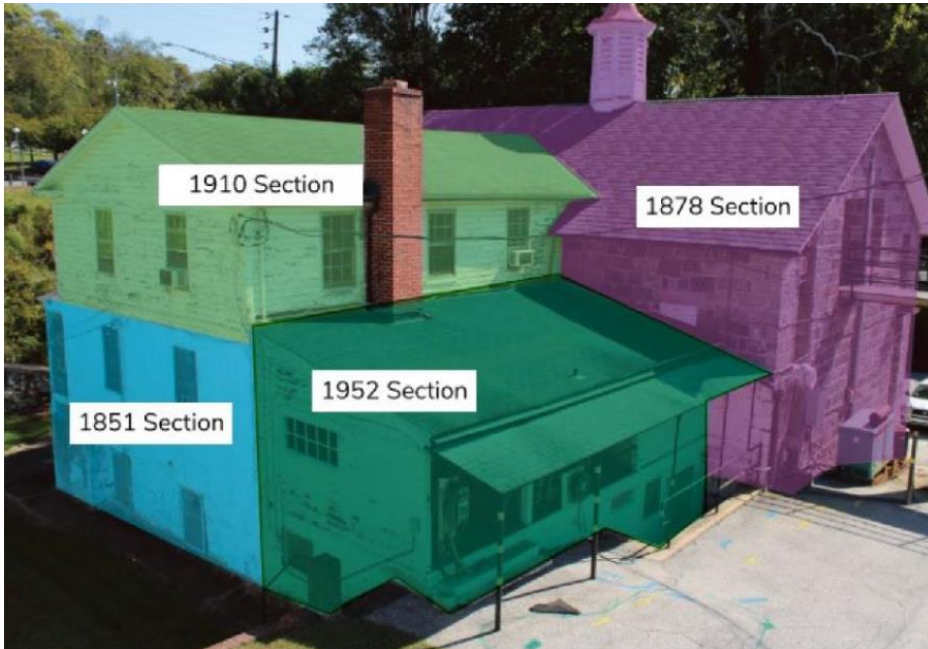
Graphic of building showing various sections and dates of construction from 1851, 1878, 1910 and 1952.
